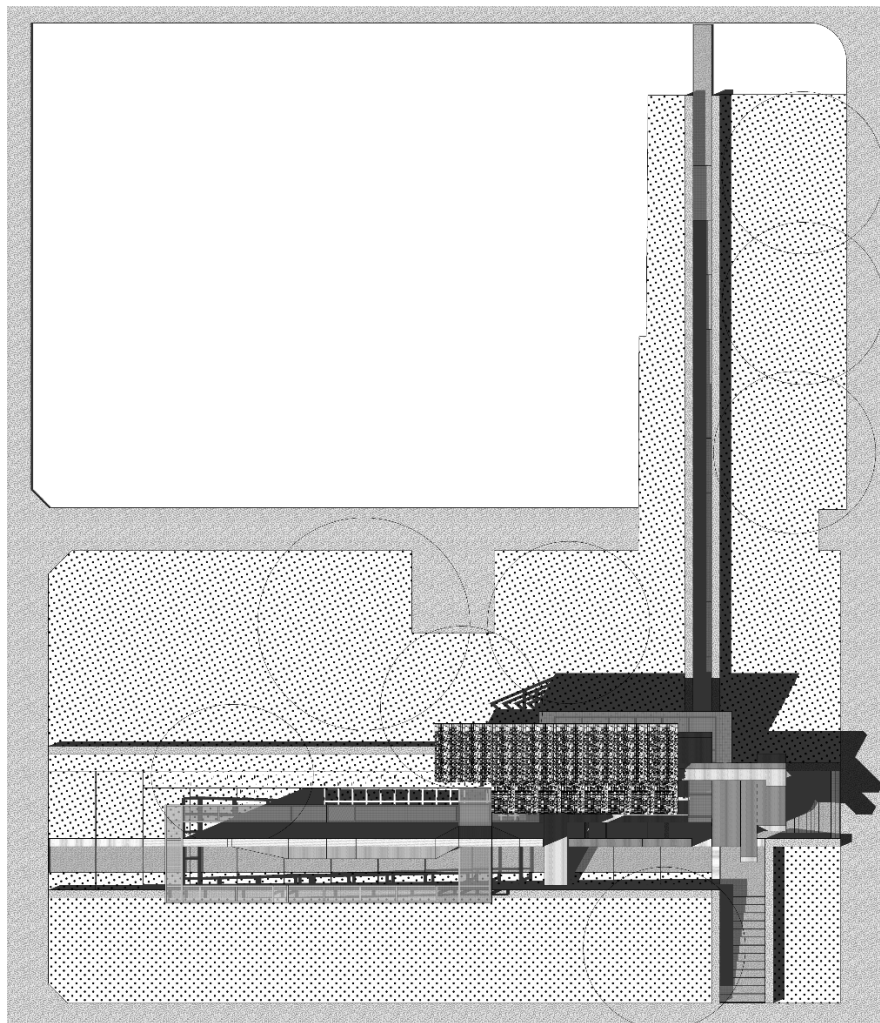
Hideaway Park Folly, Roof Plan, by Author
